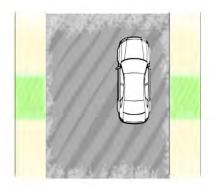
Urban Alleys (Local Road-Street Section T)
